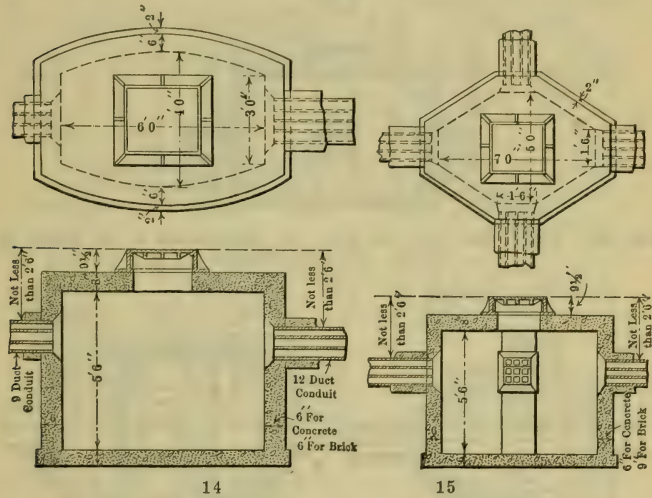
Vault size 5 to be used on runs of 9 to 12. Ducts of conduit when not intersected.
